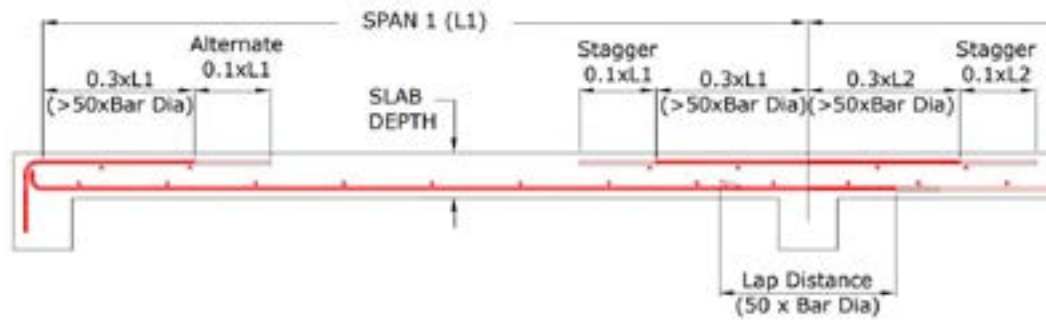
A - SLAB REBAR LAYOUT - SPAN 1
